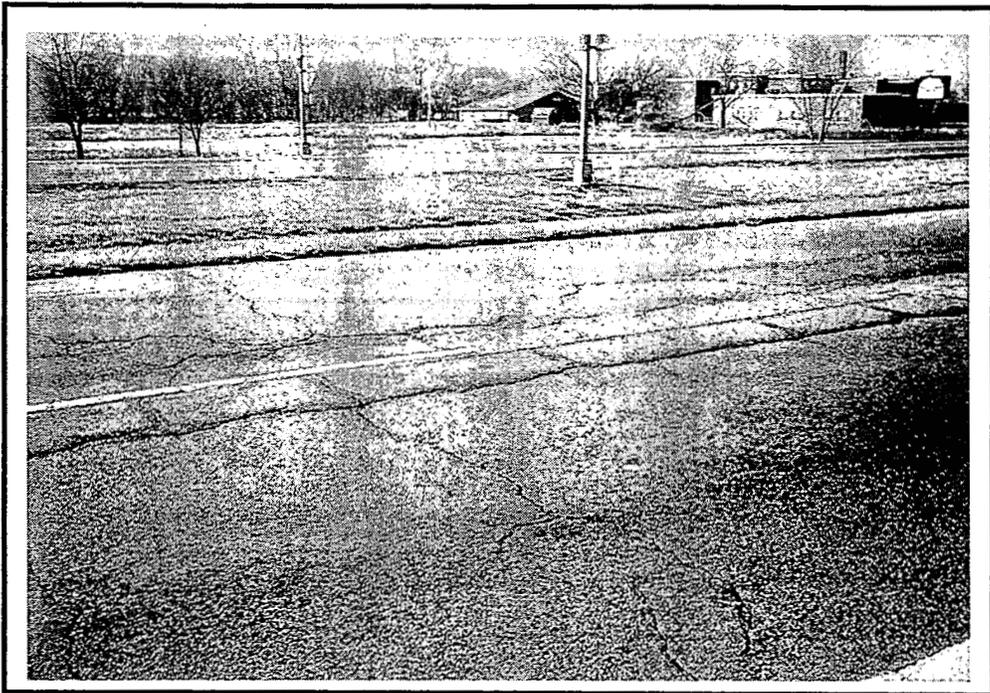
Crack Sealing Deficiency, Unsealed Cracks
